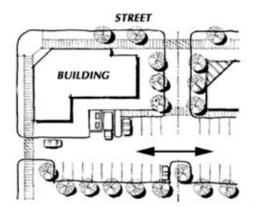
Shared parking and access serve to connect commercial projects
